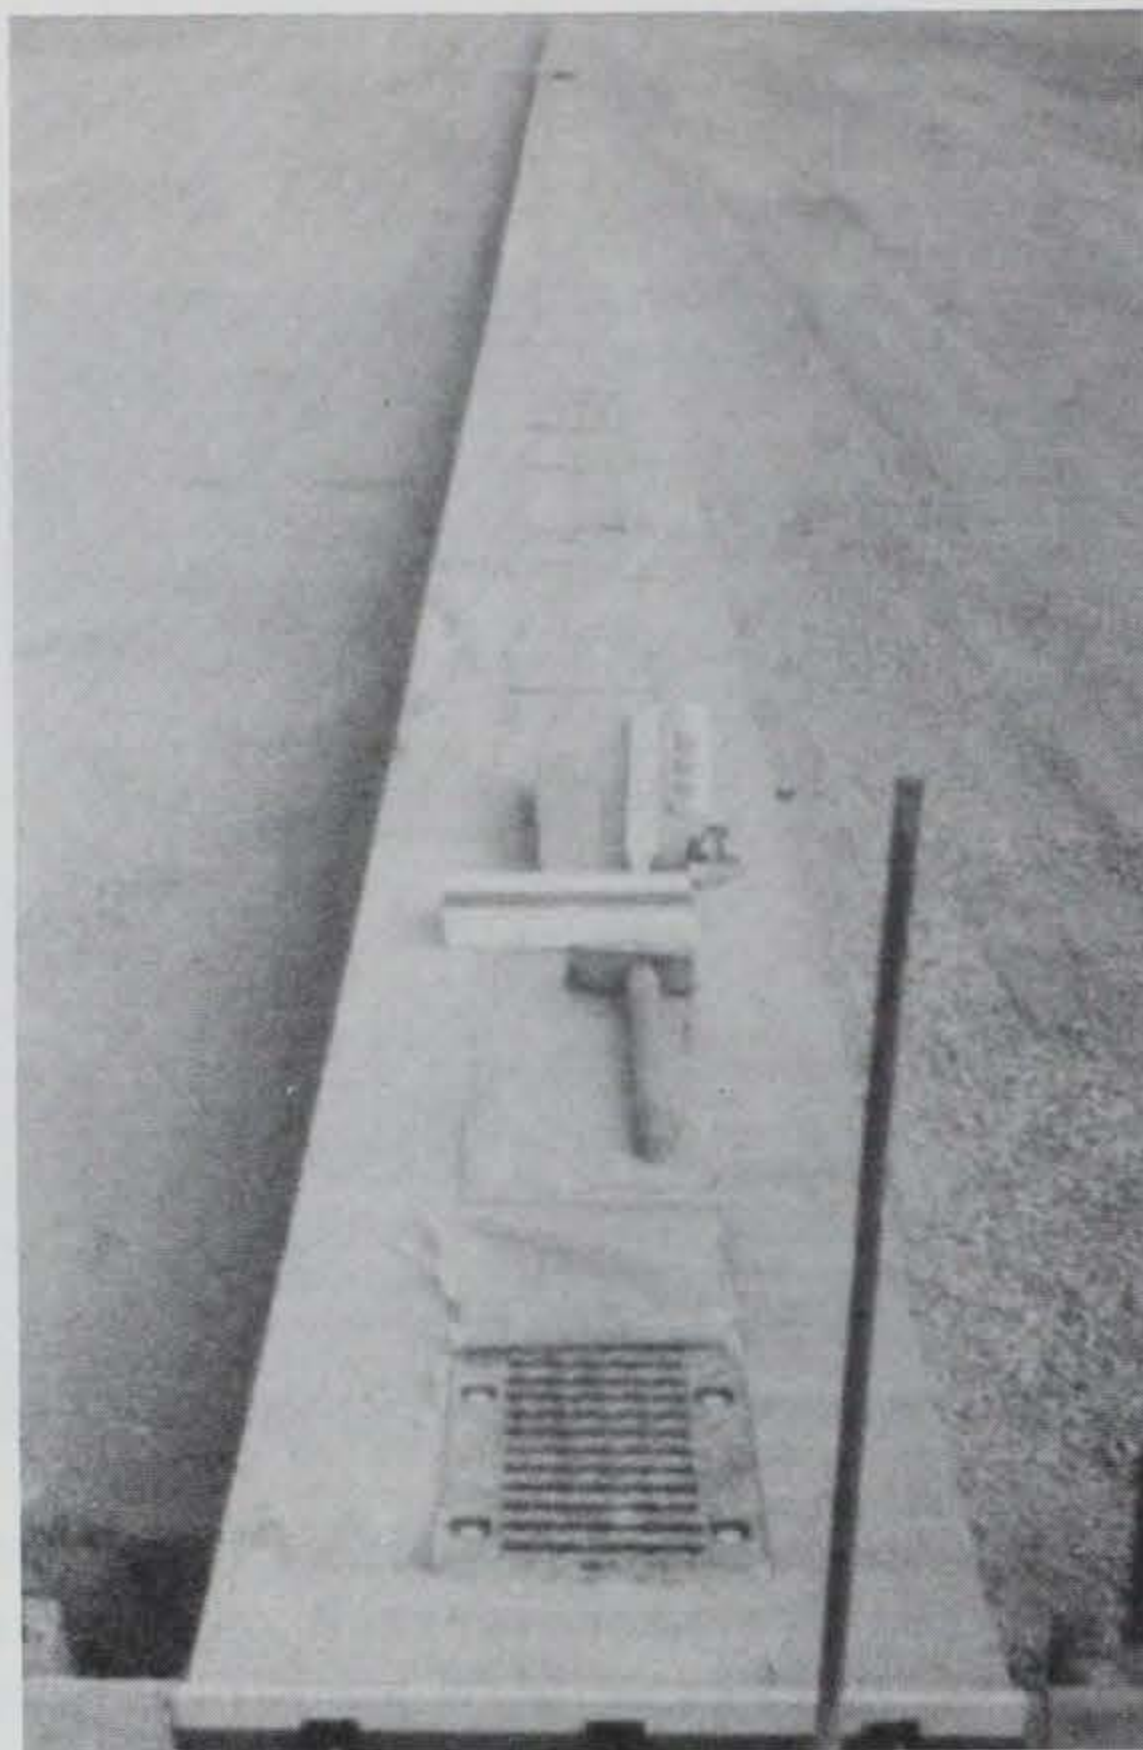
Long drainage gutters were secured in place with a 6-inch wide strip of concrete
